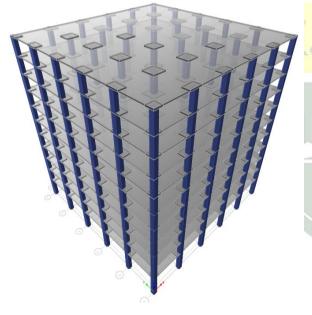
3D model of flat slab without edge beam & without shear wall.
